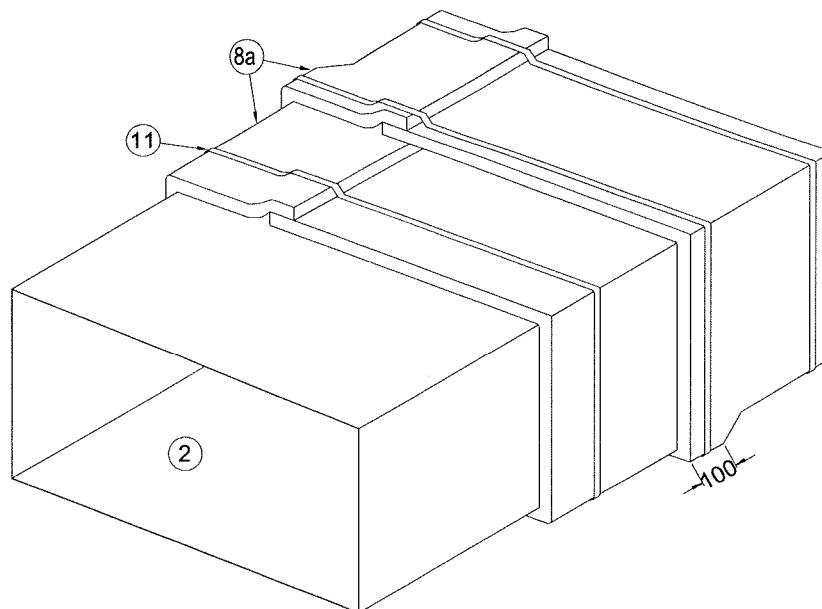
Detail Showing Fire Barrier Duct Wrap 615+ Overlap & Banding
